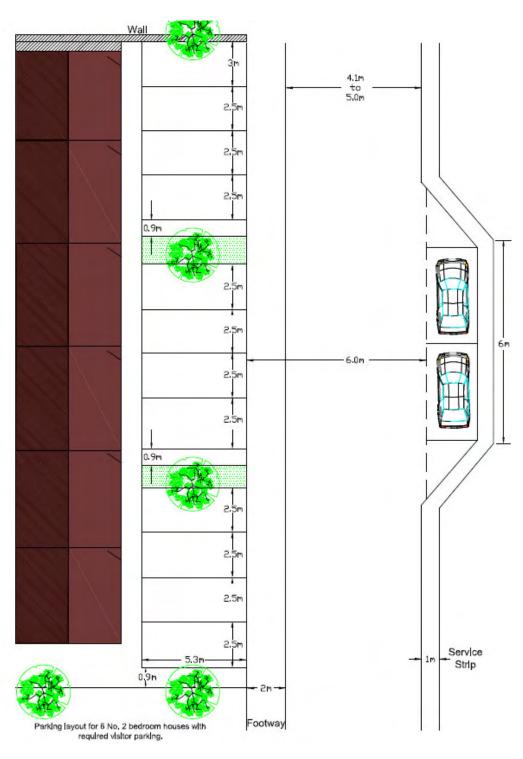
Parking layout for a terraced development showing minimum parking dimensions and on-street visitor parking. Parking bays punctuated with pedestrian access paths and green areas for planting that breaks the visual dominance of parked vehicles
